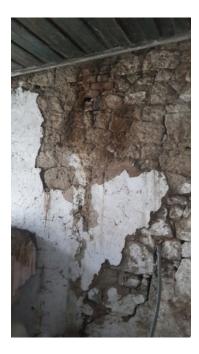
The west wall of the building. (Photograph: Author, 2019)
